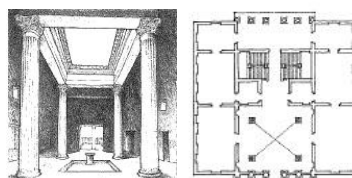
a) The four columns not only supported the vaulted ceiling, and the floor above but also adjusted the dimensions of the rooms to Palladian proportions.
